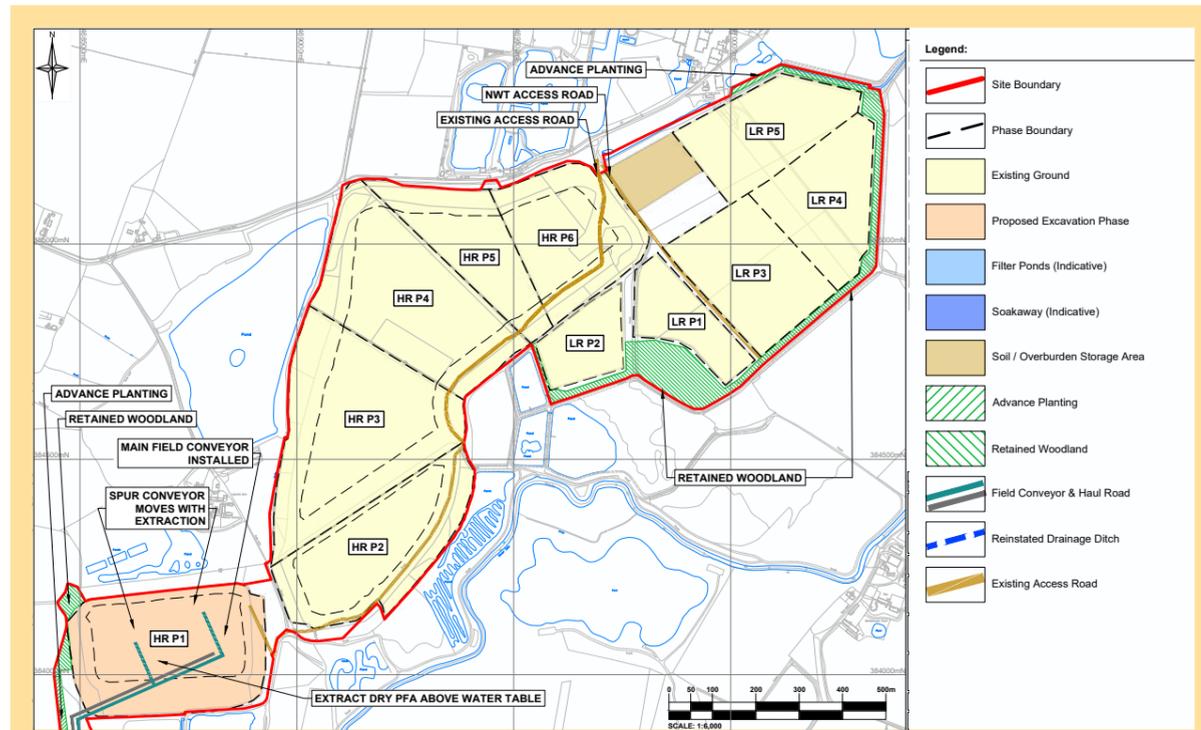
Stage 1 - Site establishment & HR Phase 1 excavation
